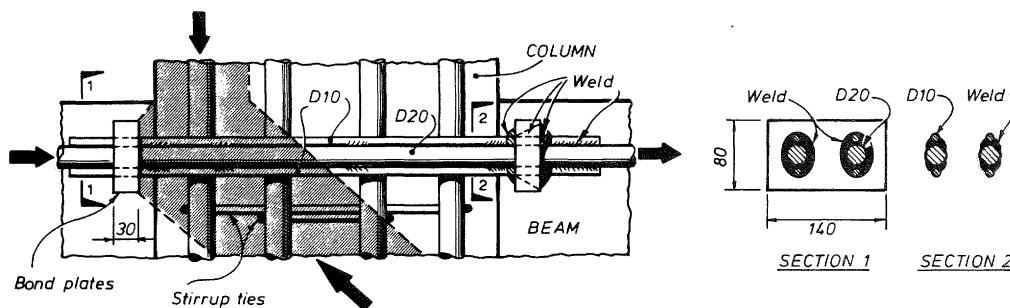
BEAM BAR ANCHORAGES AT INTERIOR JOINTS BY MEANS OF WELDED ANCHORAGE PLATES [9]
